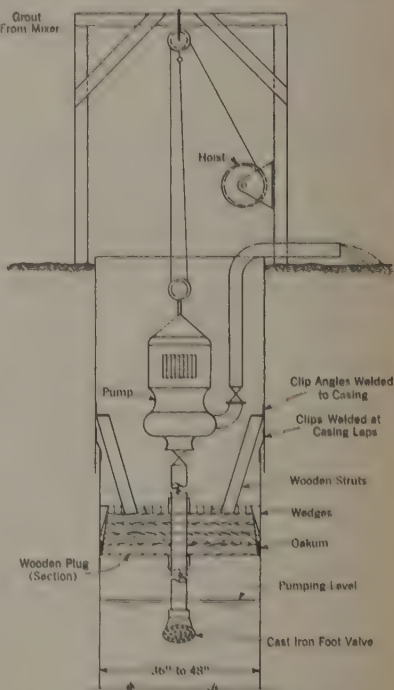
INSTALLATION OF WOODEN PLUG FOR GROUTING THROUGH LARGE HOLES
